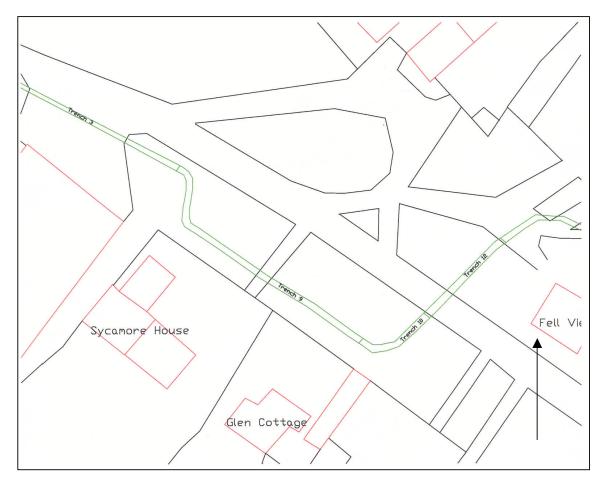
Trench Location Plan. Centre of the village, showing trenches 3,9,10,10. Scale. 1:500 @A4
